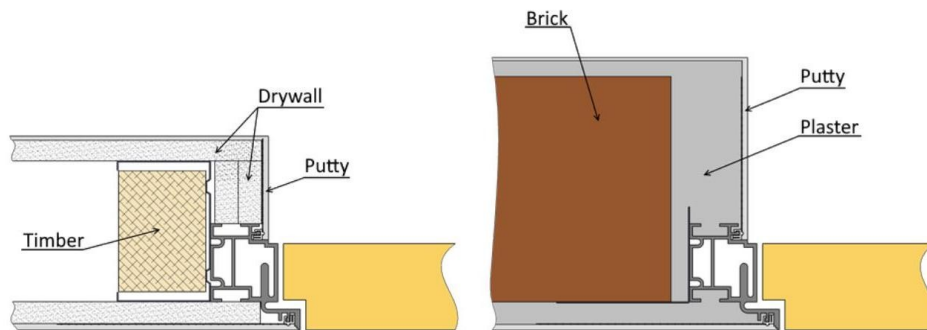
Recommended joint detail: drywall construction (left) and brick/masonry construction (right)
